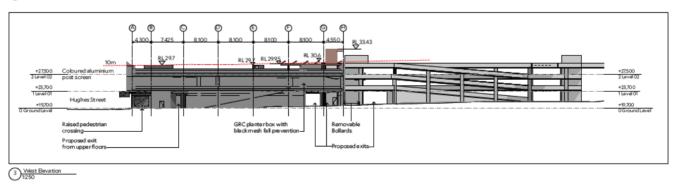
Elevations of the proposed Hughes Street Carpark (Source: Collins and Turner)
